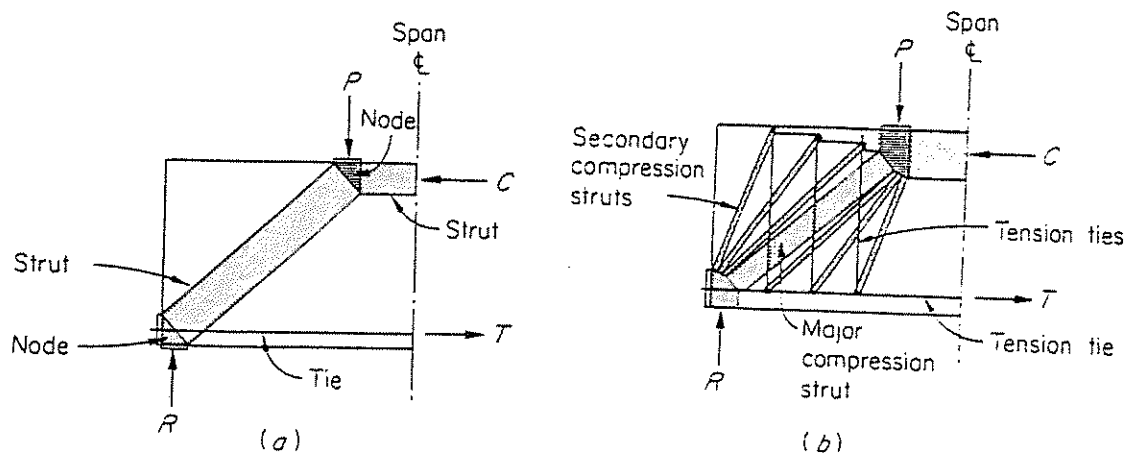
Truss models (a) beam without stirrups and (b) beam with stirrups, adopted from (20).
